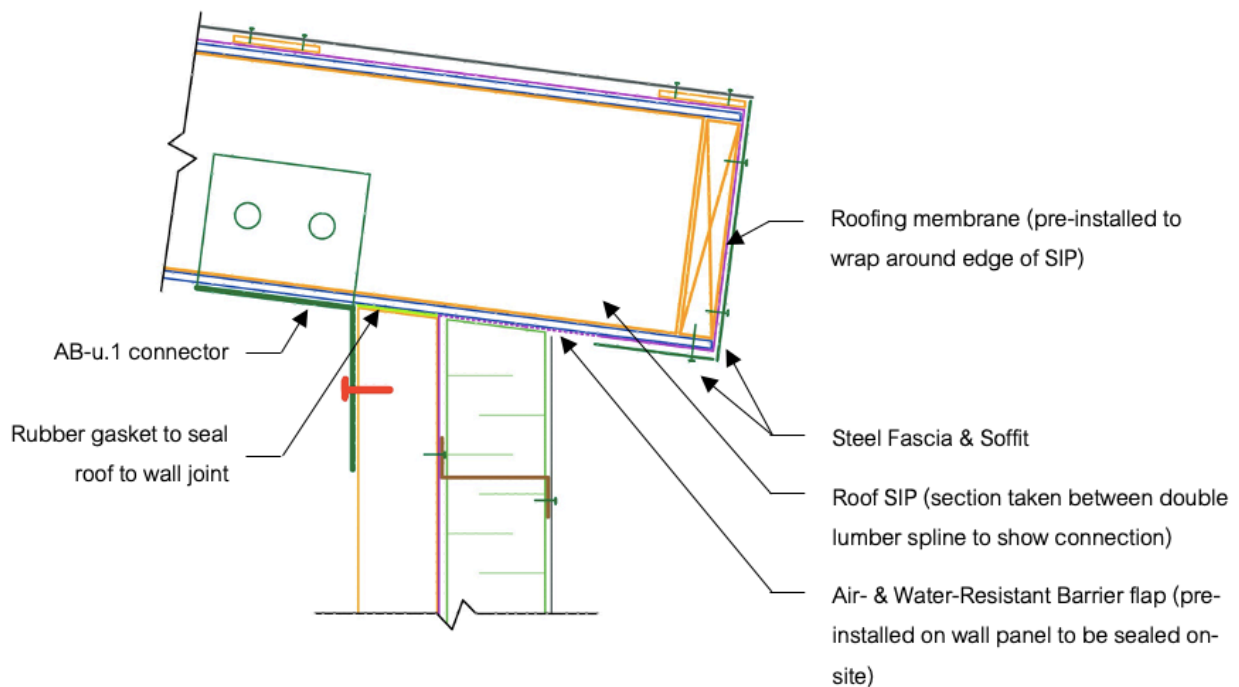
Wall to Roof Panel Enclosure Connection
